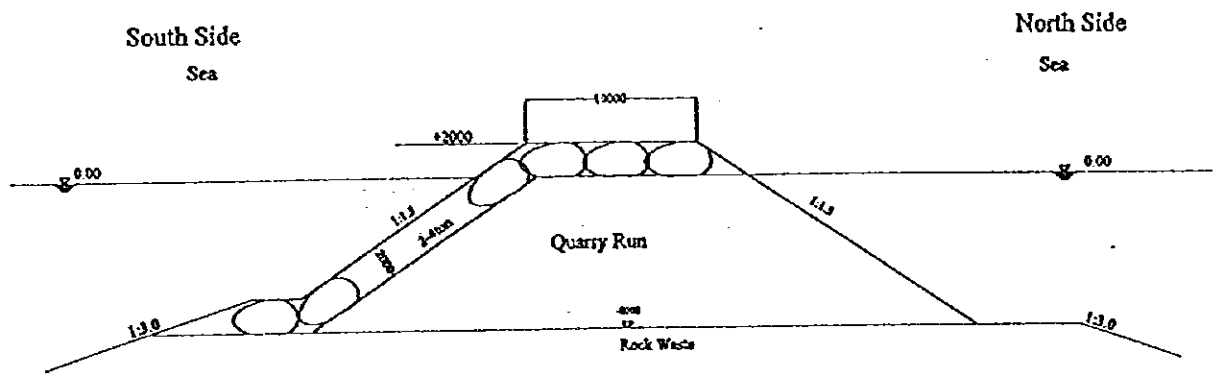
Typical Cross Section of Temporary Breakwater
